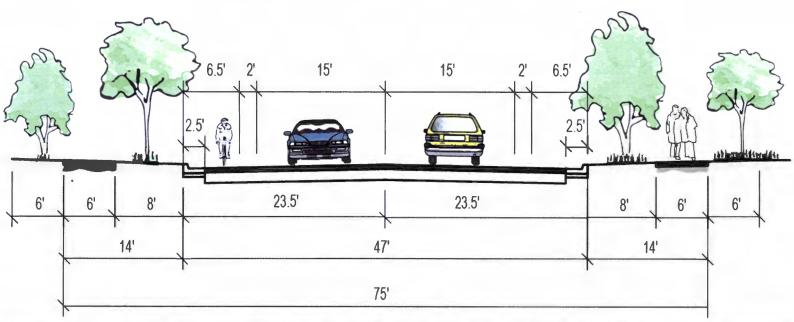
Carson Crossing Drive Extension Typical Planned Section (center left turn lane may be added at key intersections/entries)
